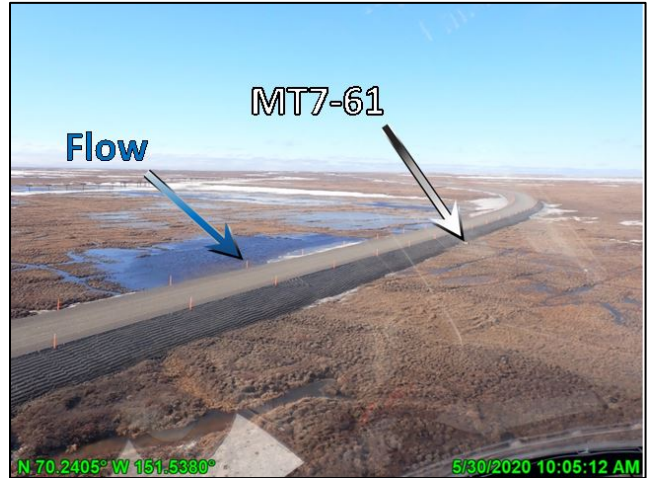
Ponding near culvert MT7-61 looking north; May 30, 2020
